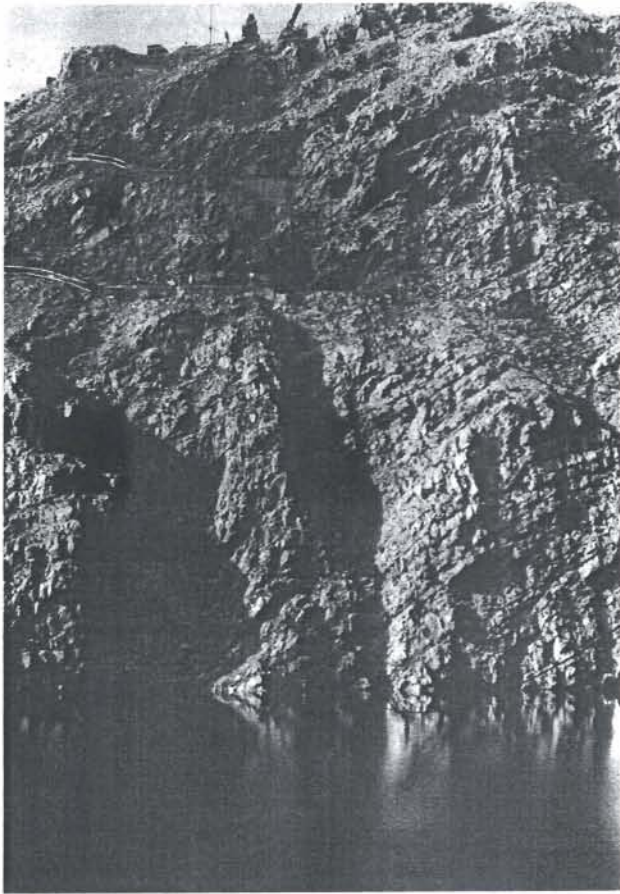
Detail on the location of the arch foundations of the west side of Novsko ždrilo before the excavation of the foundation site
